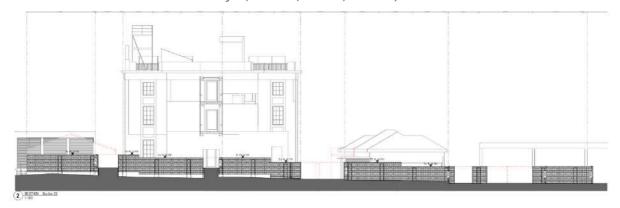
Section view north (Source: FJMT, DA-5001, SSDA01, 18.12.19)
